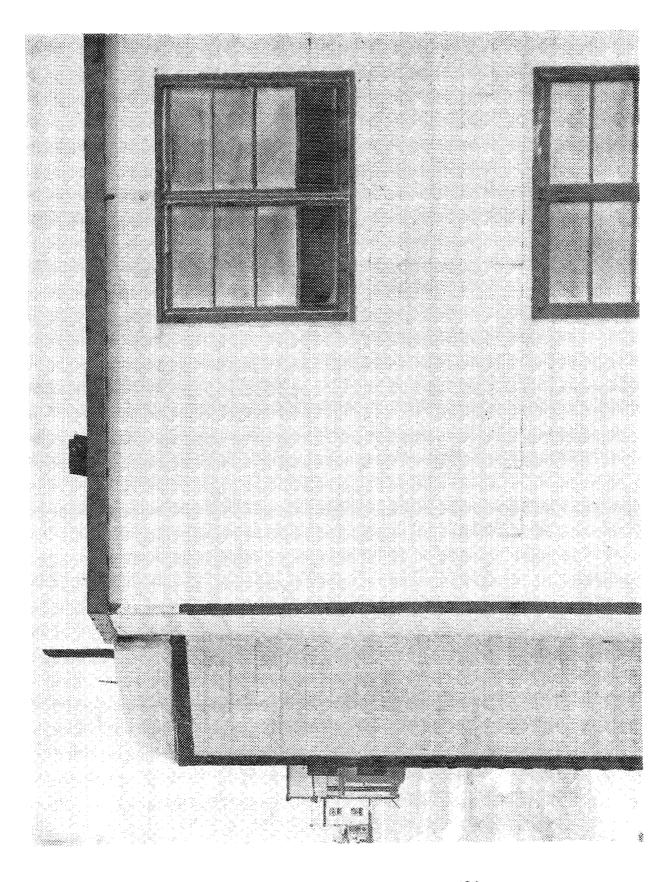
Churchill, Man. (January 13, 1958). Building F-2. Snow accumulation on lowered roof section (main roof is bare).
